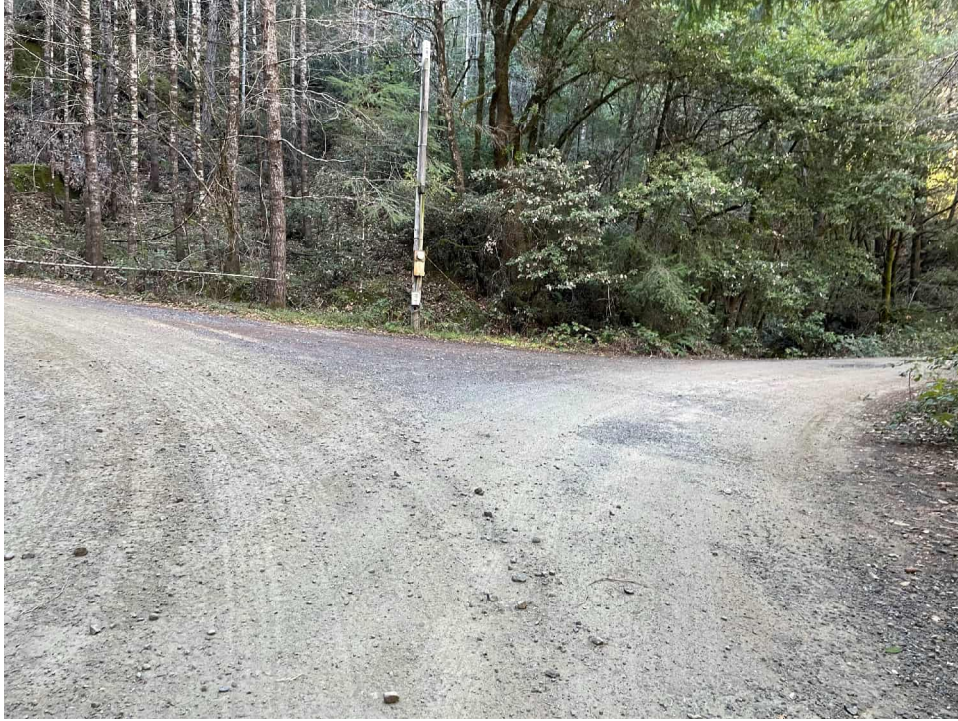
RP3. Milky Way Loop - 14' dirt/gravel road width with righthand +/- 14 road intersection. Image shown facing west.
